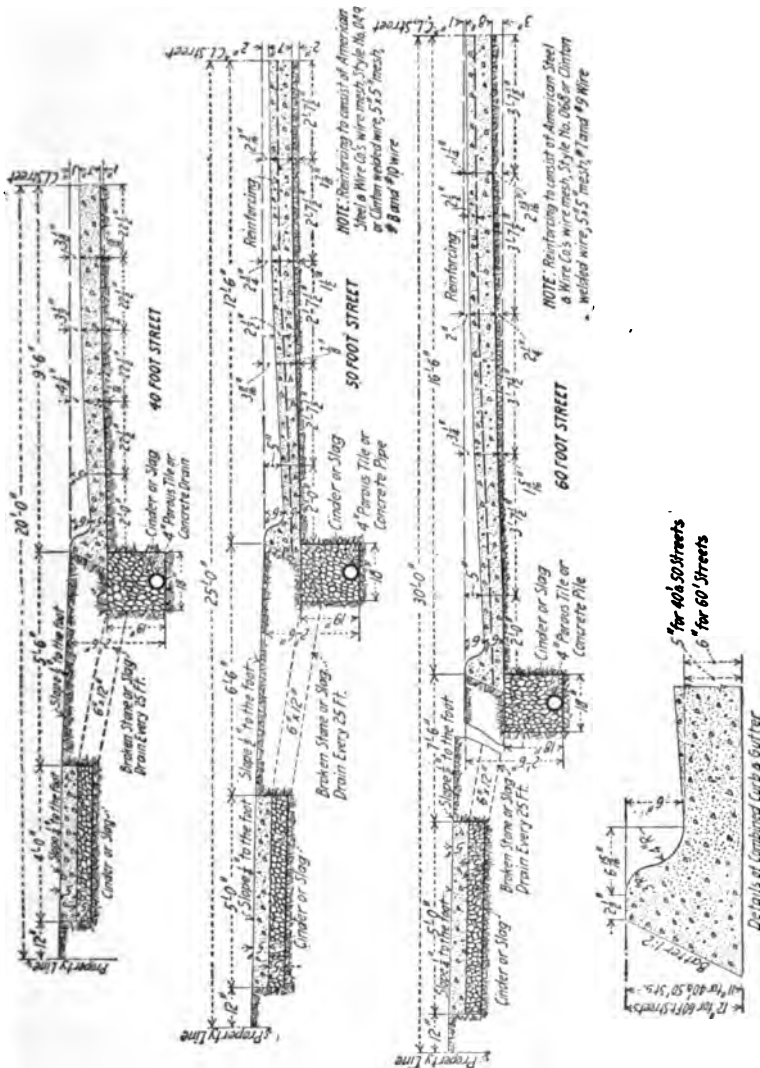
Street pavement and sidewalk construction; typical sections and details from the Loveland Farms Housing Development, Youngstown, Ohio.
